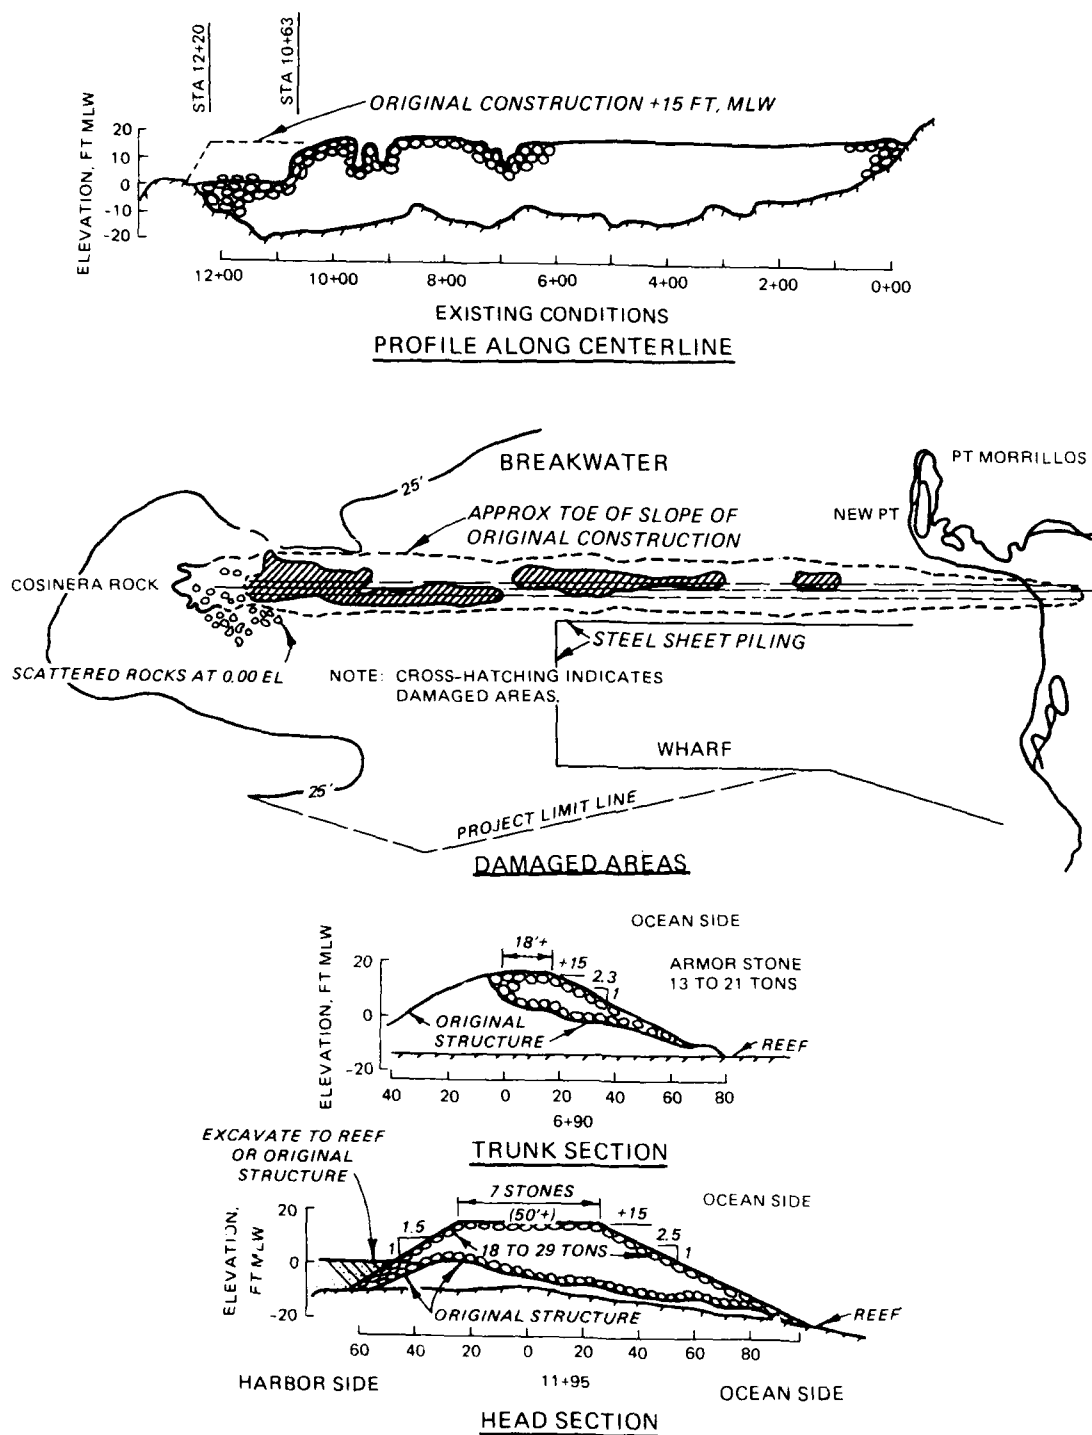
Arecibo Harbor existing damage prior to 1984 repairs and typical repair sections
